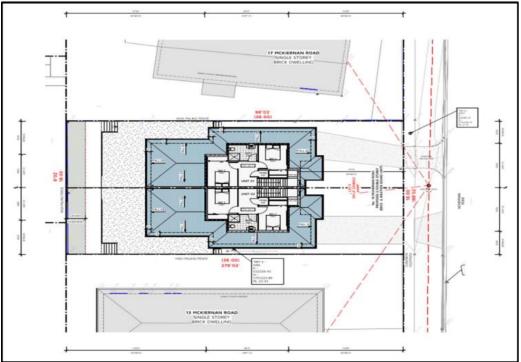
First Floor Plan of the proposed development. Source: Application submission.
